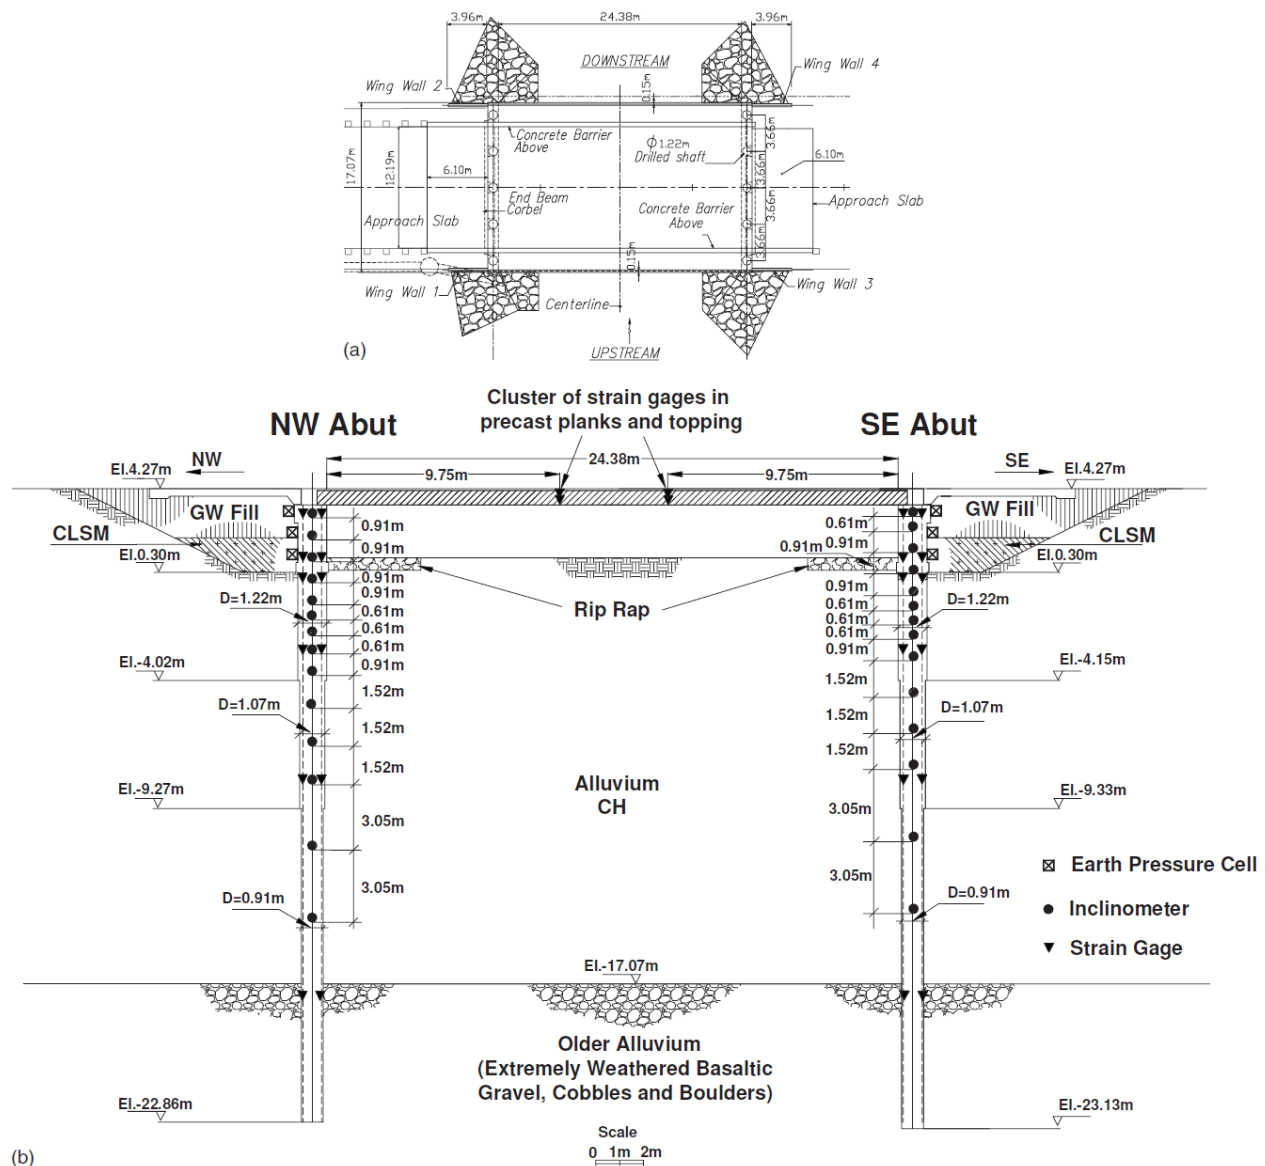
Kii Bridge layout and instrumentation details: (a) plan view; and (b) profile view (Ooi et al., 2010)
